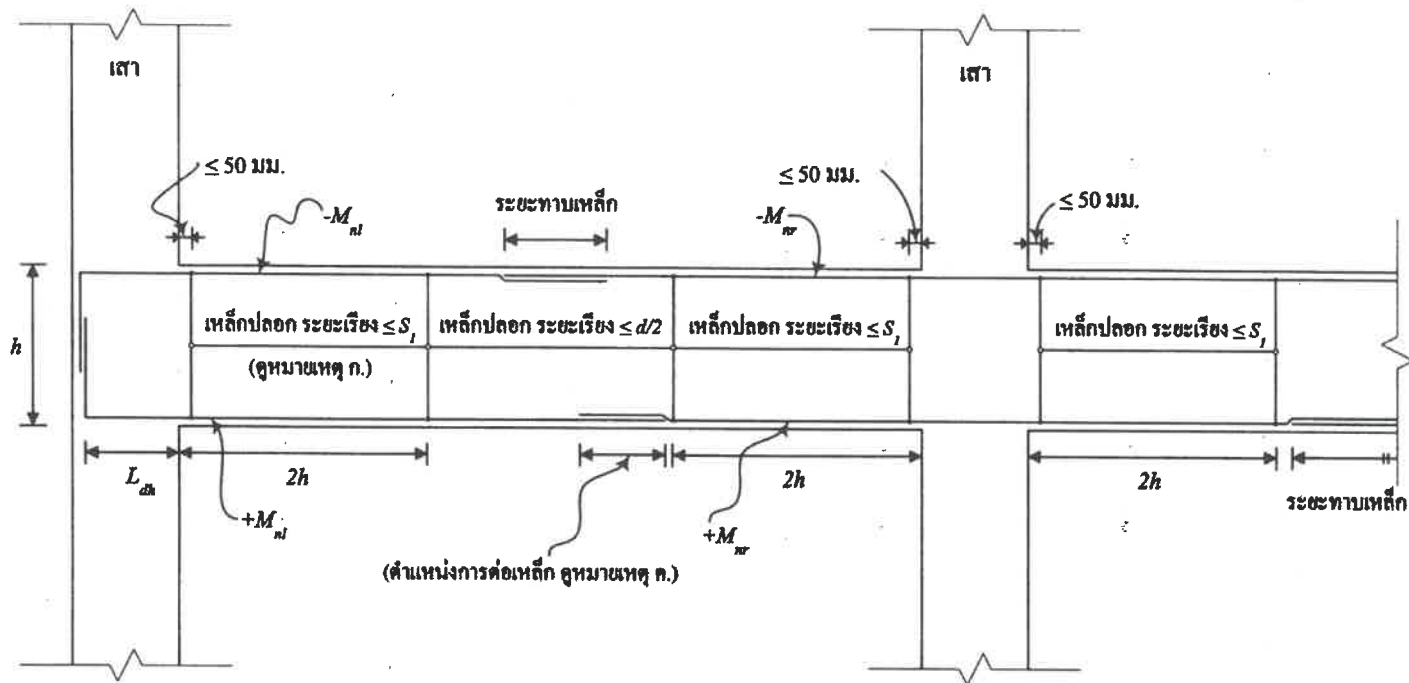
Non-Ductile Rebar (Not to Used in Design)
